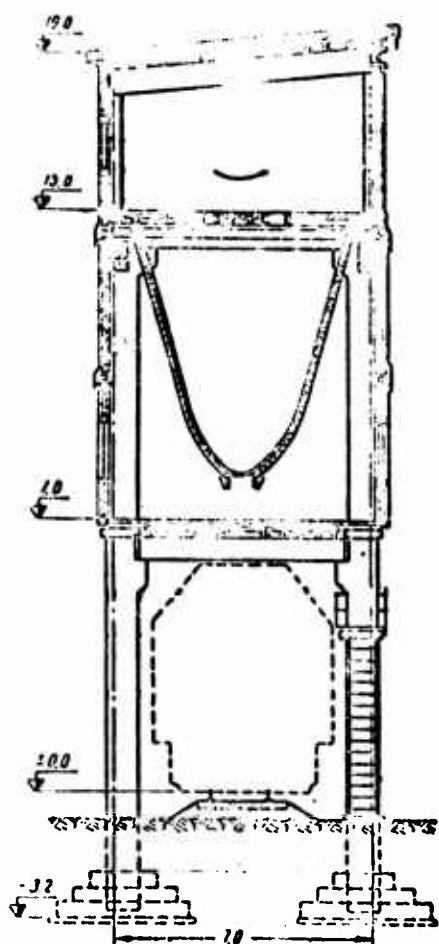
Precast ferroconcrete loading hopper with a suspension parabolic capacitive part.
